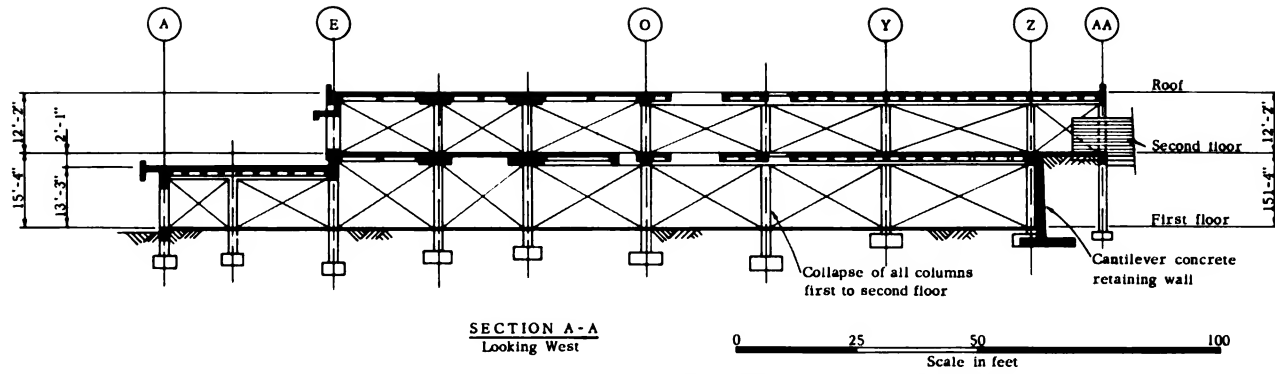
Olive View Hospital, psychiatric unit. Building cross section.
